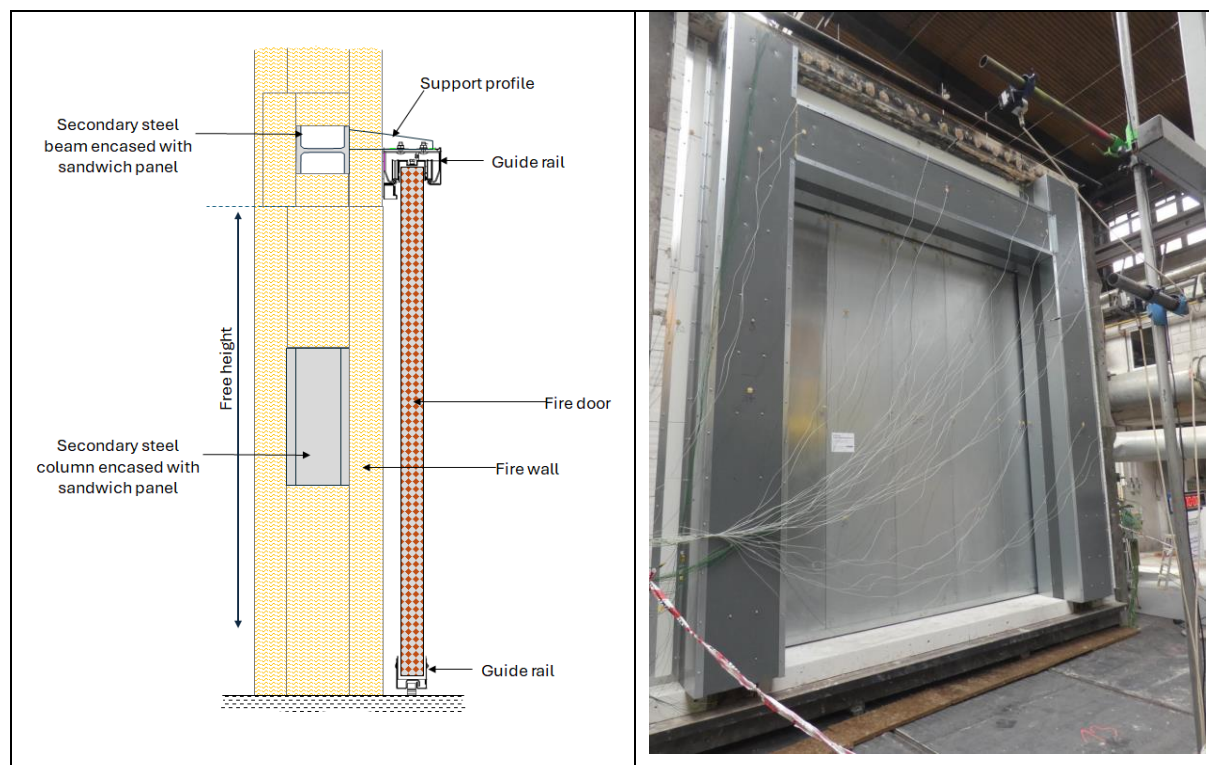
Schematic views of a fire door mounted in a partition fire wall made of sandwich panels - side view
